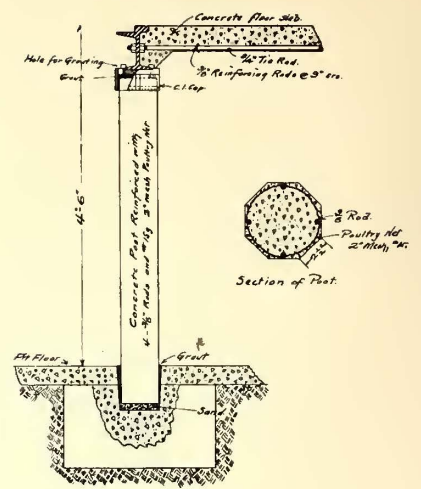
HALF SECTION OF SHOP, SHOWING REINFORCEMENT
